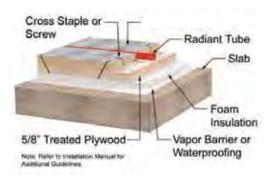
Concrete Floating Float exterior grade 5%" plywood or OSB over vapor or waterproofing membrane.
